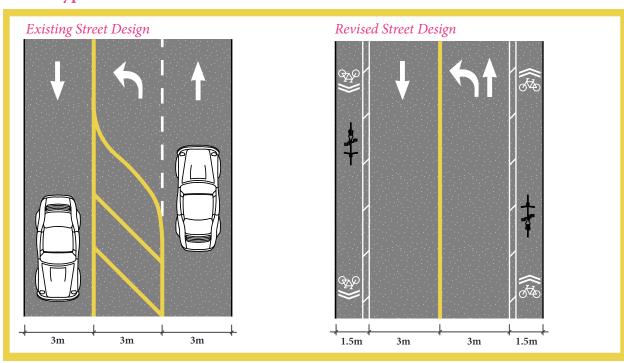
Street Design Revitalization; Street Type 2, plan
